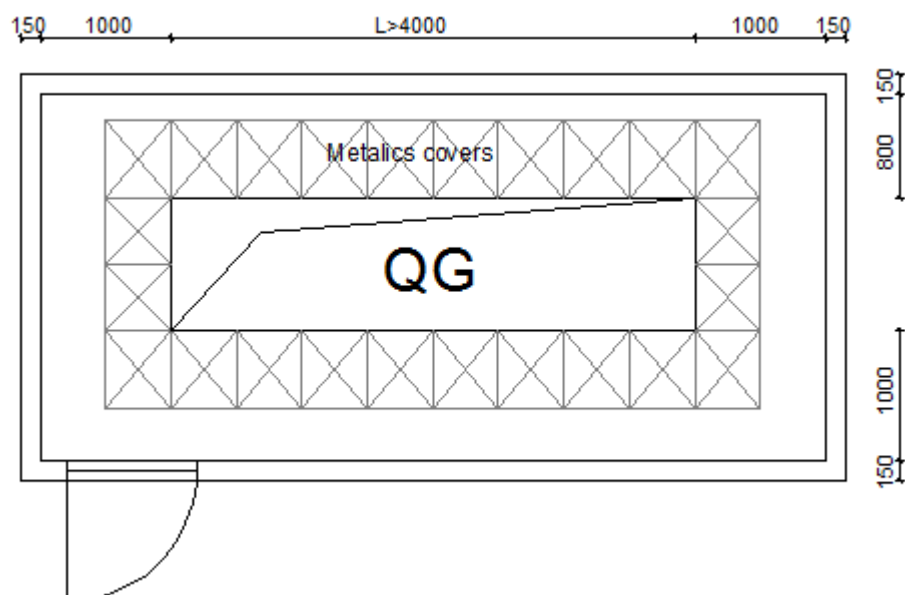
Minimum dimensions for main low voltage switchboard installation for collective installations with back connection, with length $L > 4\text{m}$.
